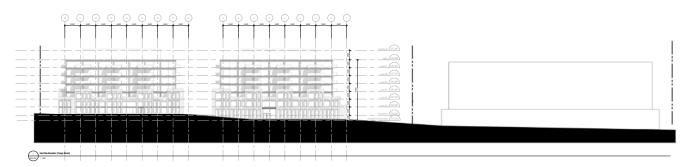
East Elevation (Yonge Street), illustrating site grading
